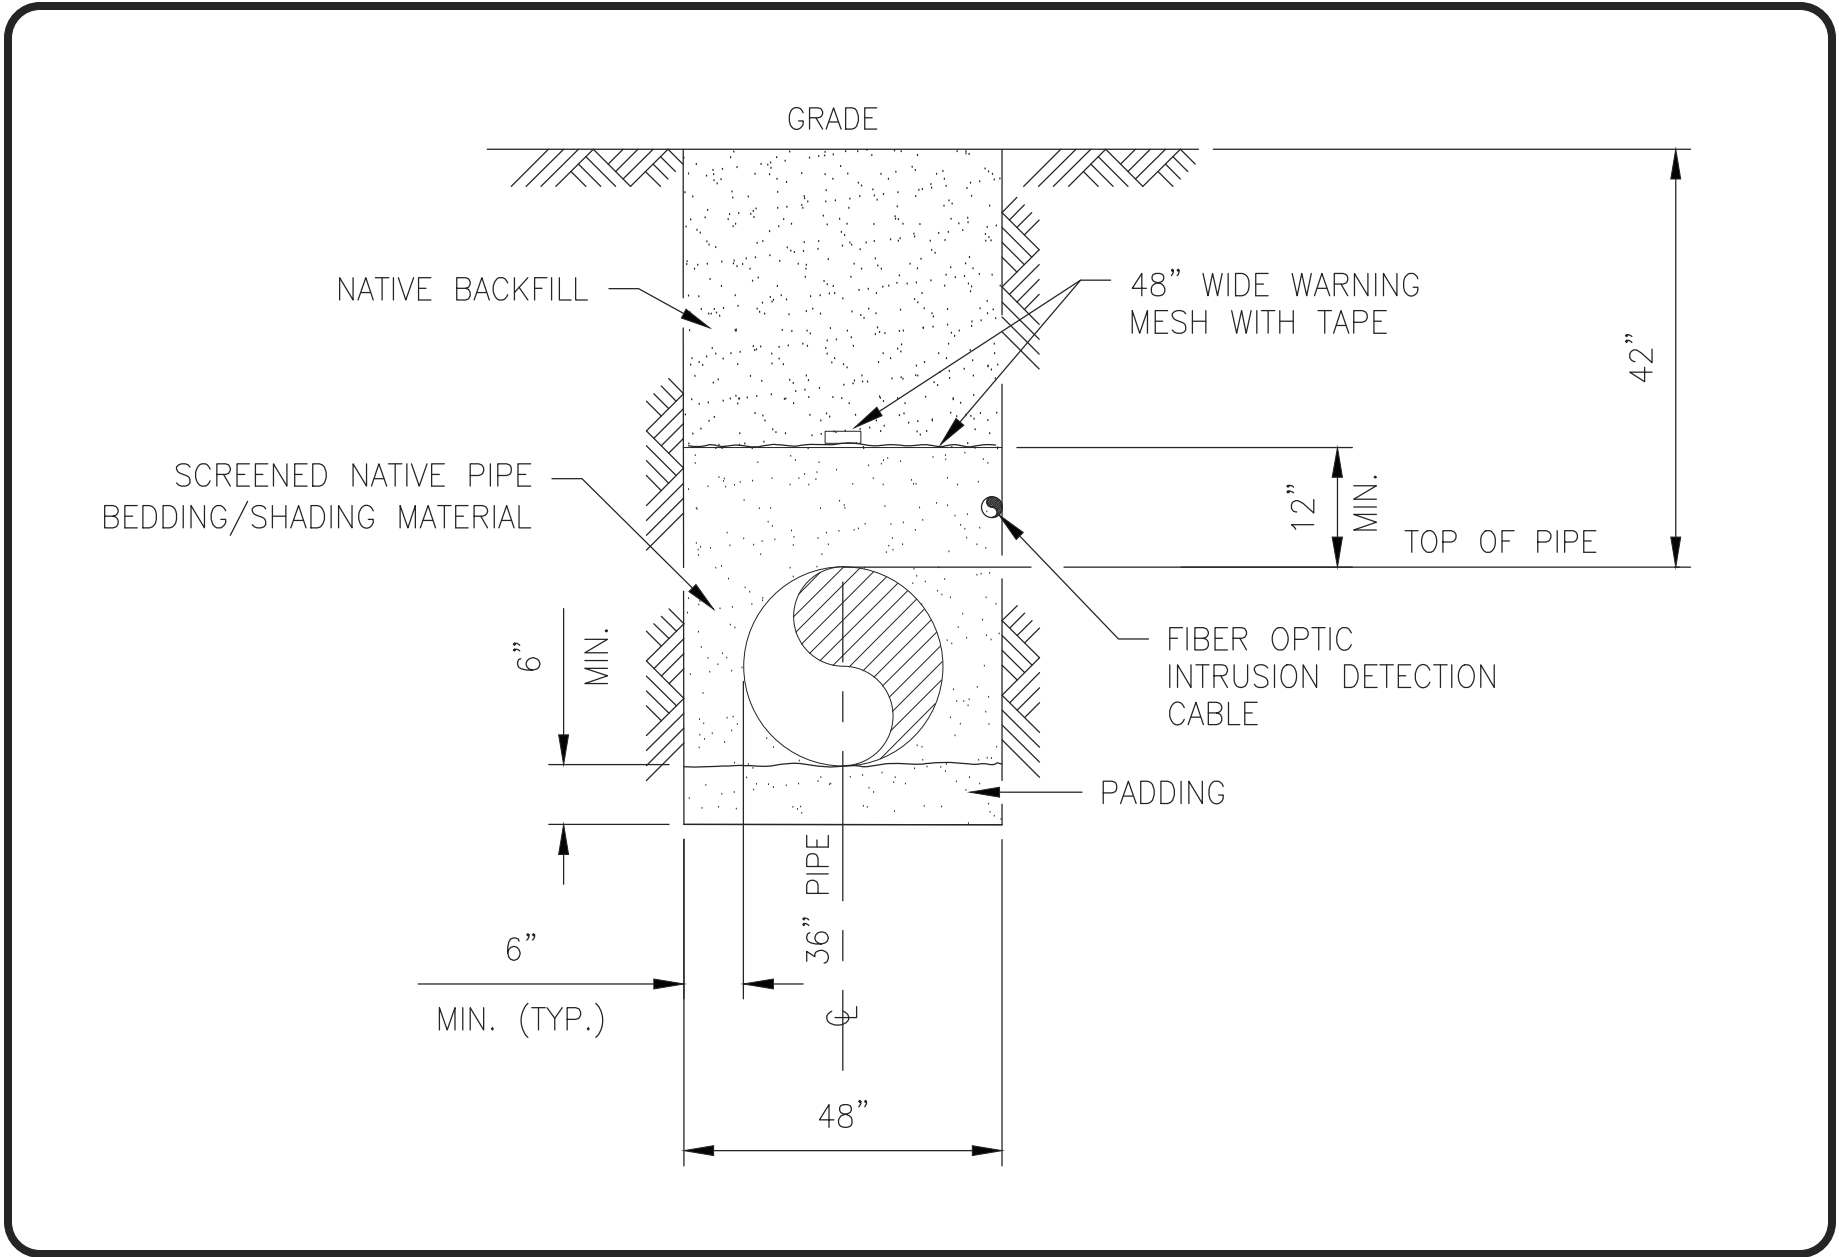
Typical Trench Cross-Section – Cross-Country
